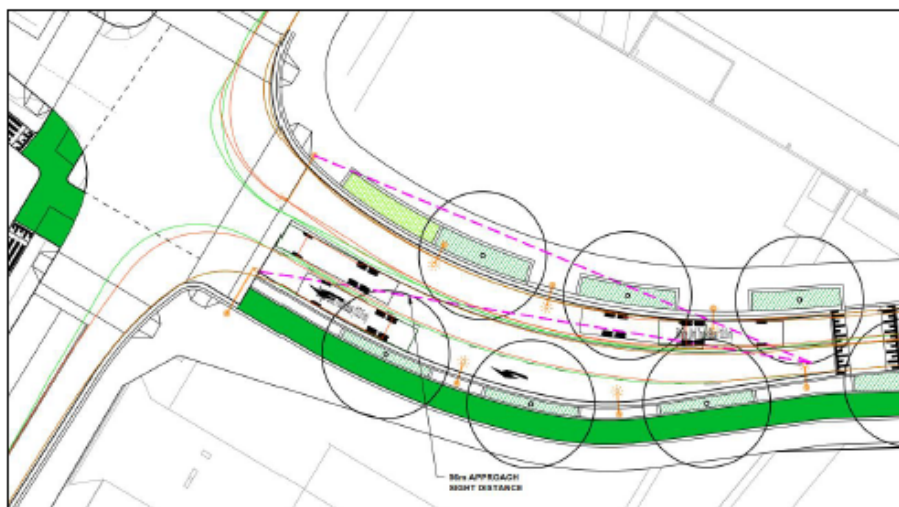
SSD assessment for Bourke Road – Connector Road intersection
